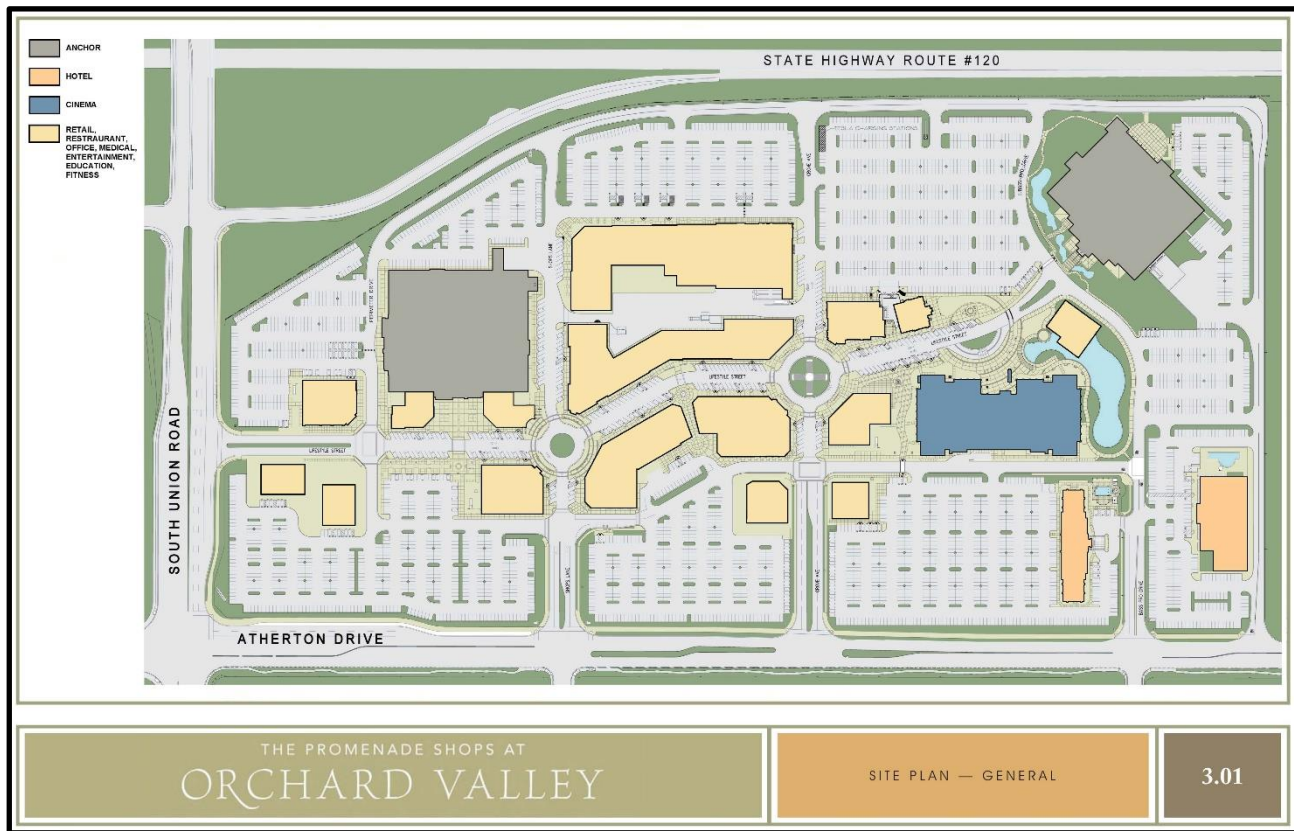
Proposed Revised Planned Development Site Plan Showing Land Uses per Building
